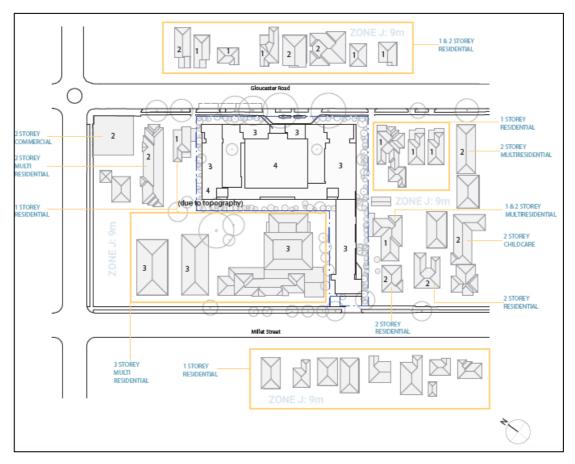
Proposed and surrounding Storey Heights Source: O'Neill Architecture
